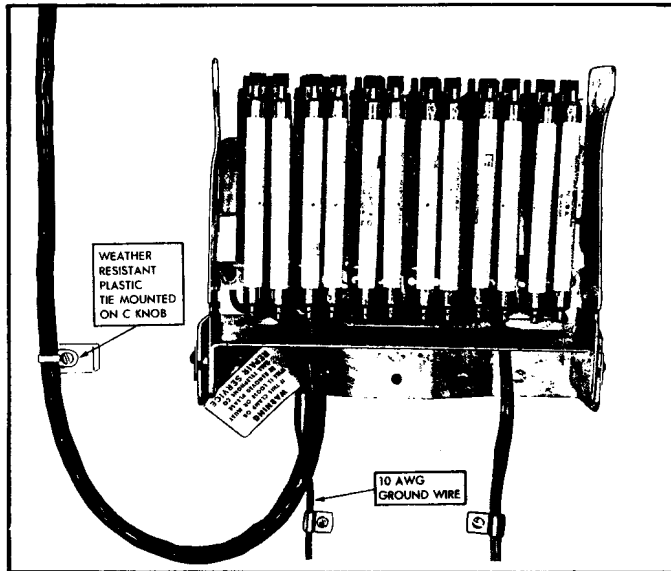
Typical Installation of U-Type Multiple Fuse Protector (Cover Removed)
